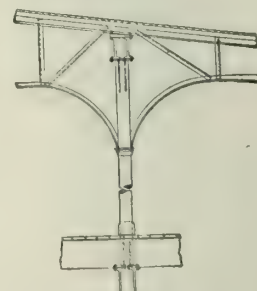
DESIGN FOR LALLY COLUMN IN RAILROAD SHELTERS
